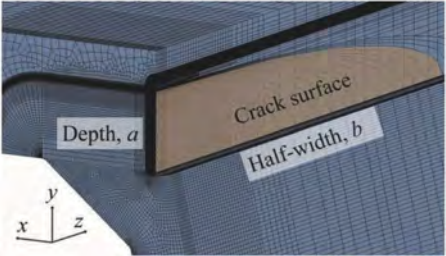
Typical crack modeling at the rib-to-deck weld with the crack surface exposed (8 mm deep crack model shown).
